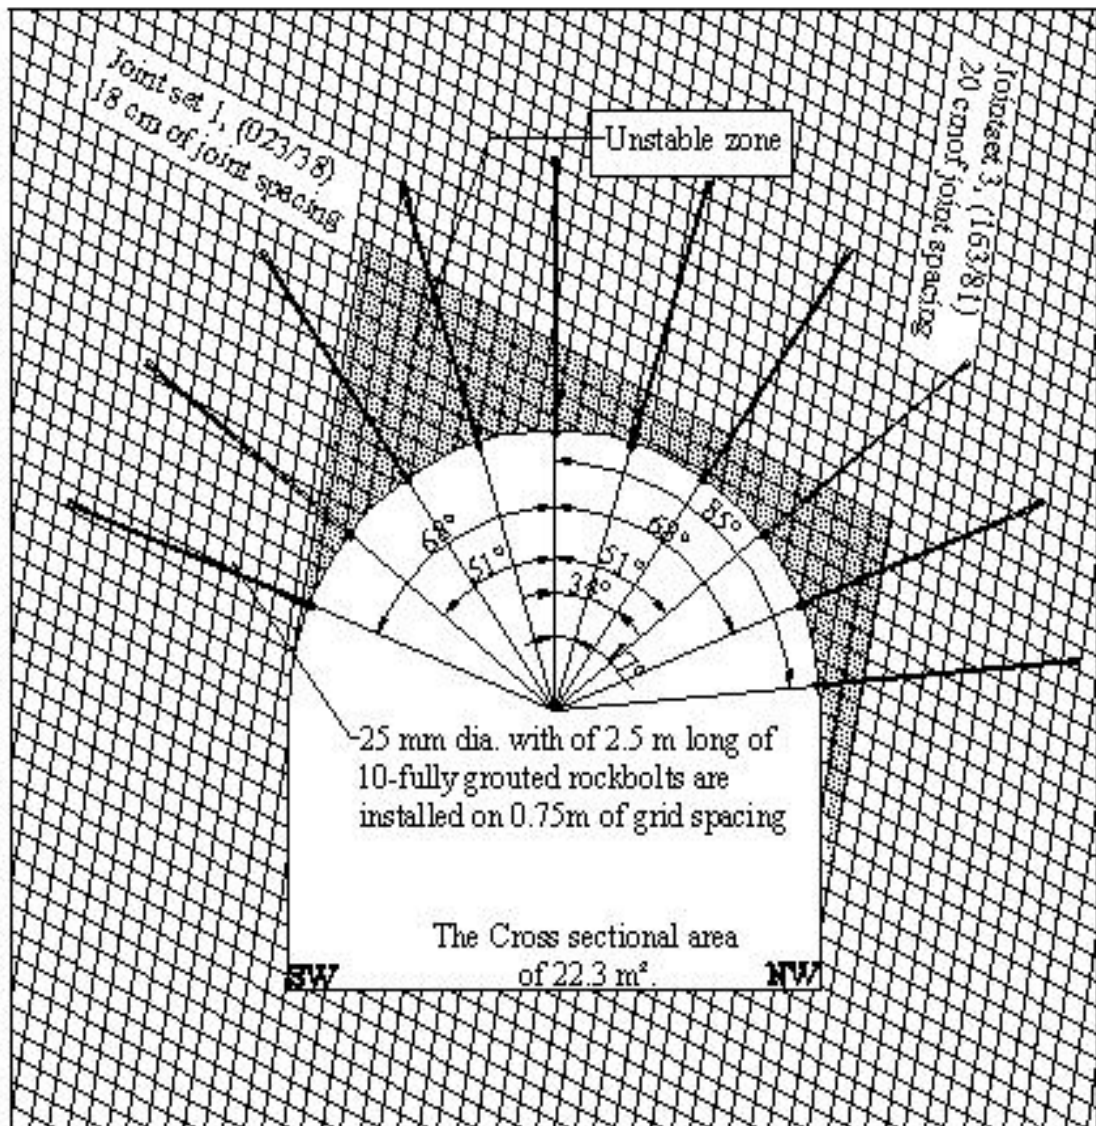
Preliminary layout of rockbolt pattern in access tunnel in the footwall low fracturing shale zone.
